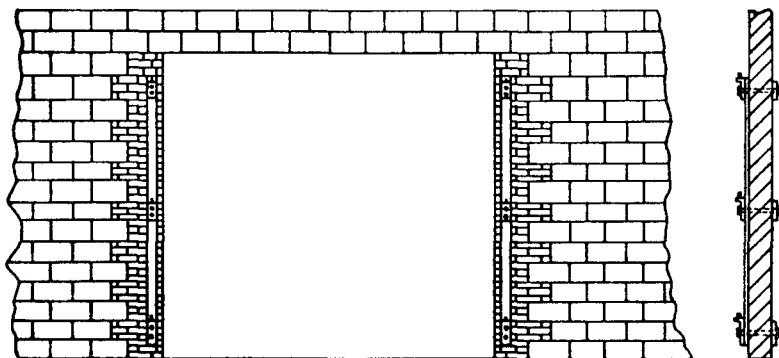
Hollow concrete masonry wall prepared for doors swinging in pairs — lap mounted, standard method.
